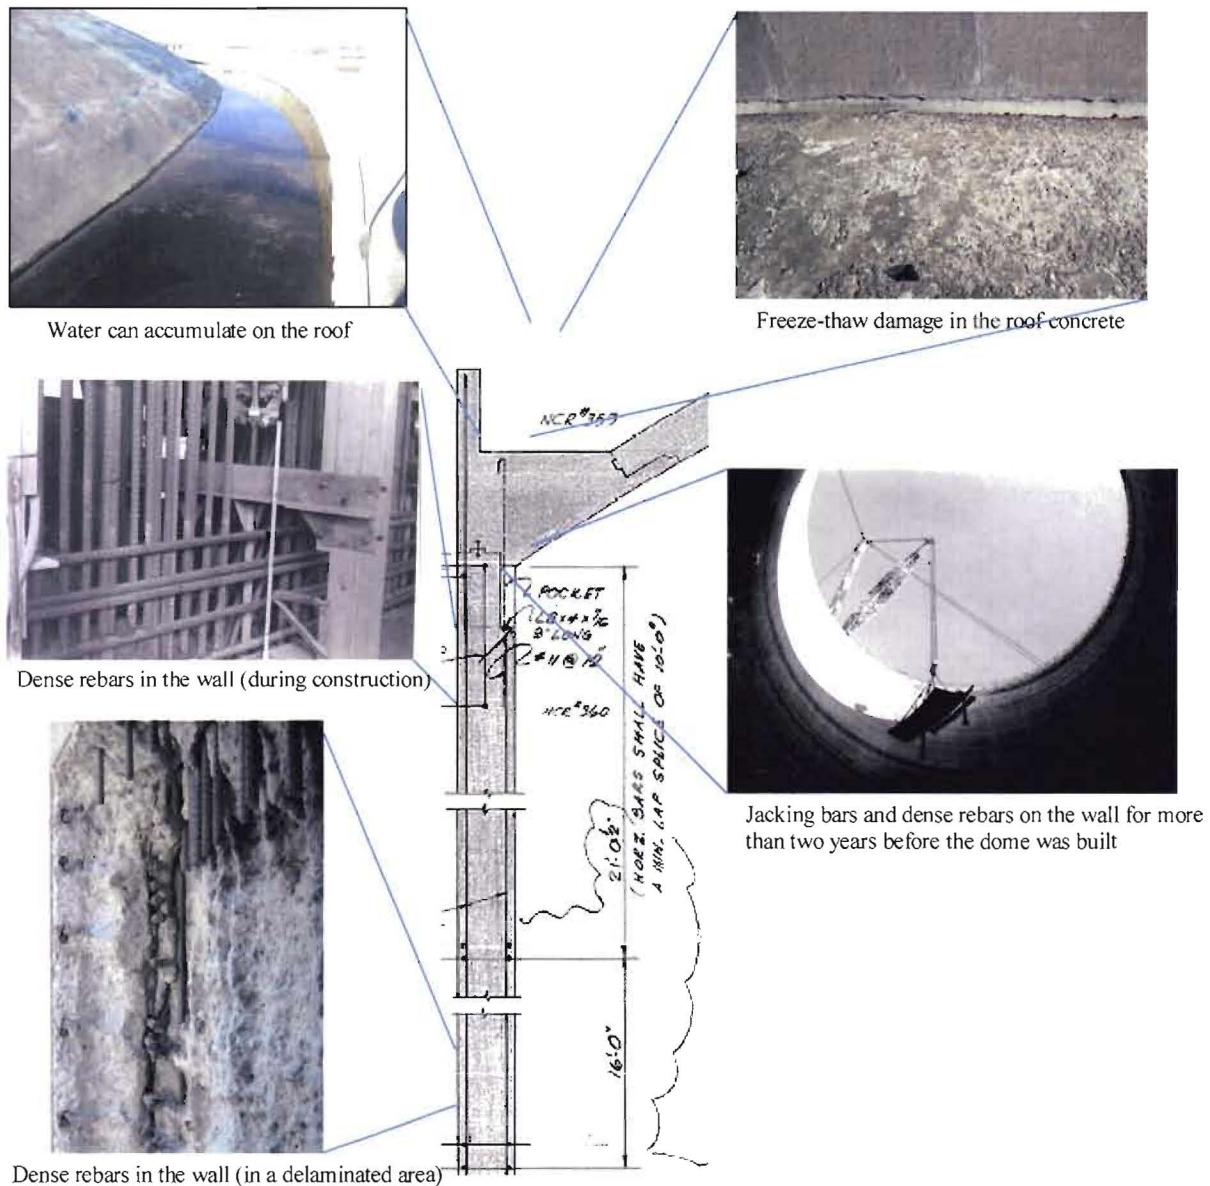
Failure mode of Type 1 freeze-thaw damage in the wall
